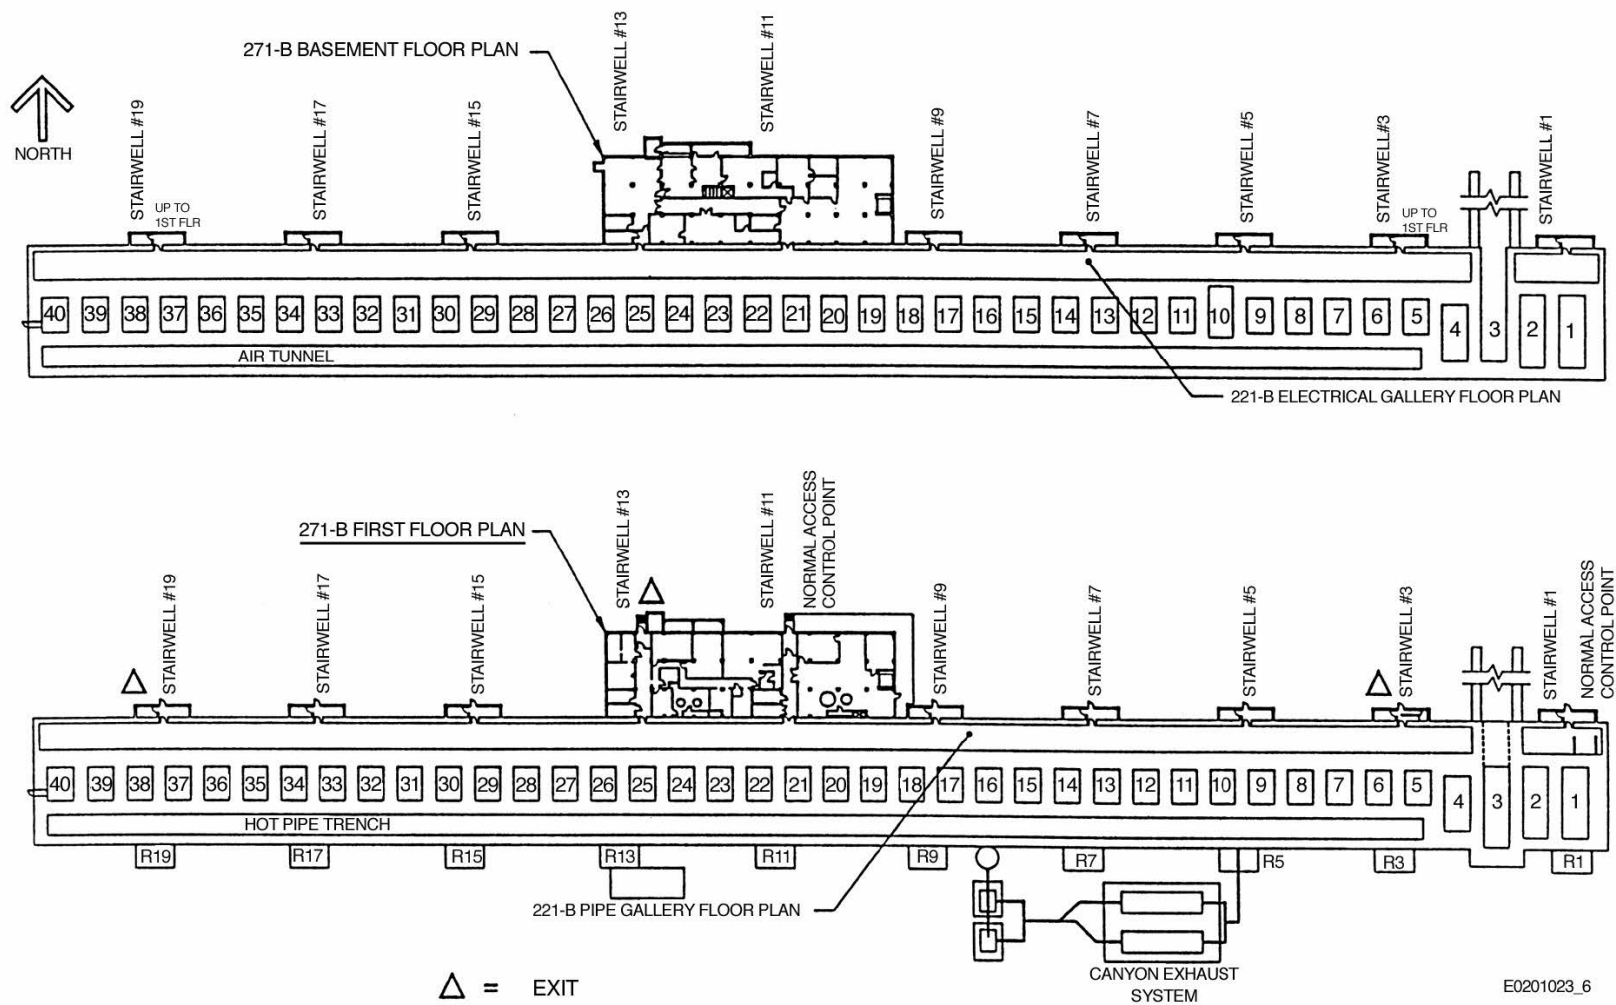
Buildings 221-B and 271-B Basement and First Floor Plans
